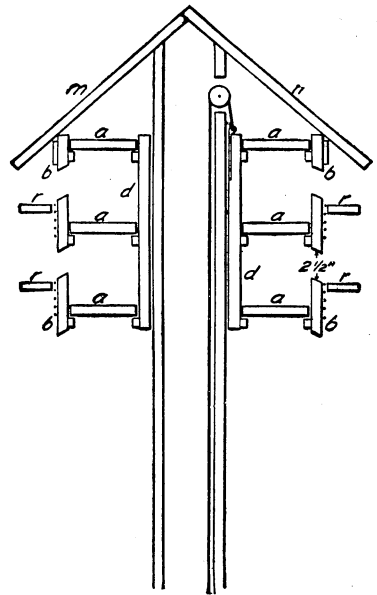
Cross vertical section of martin house; raised, and doors open.
